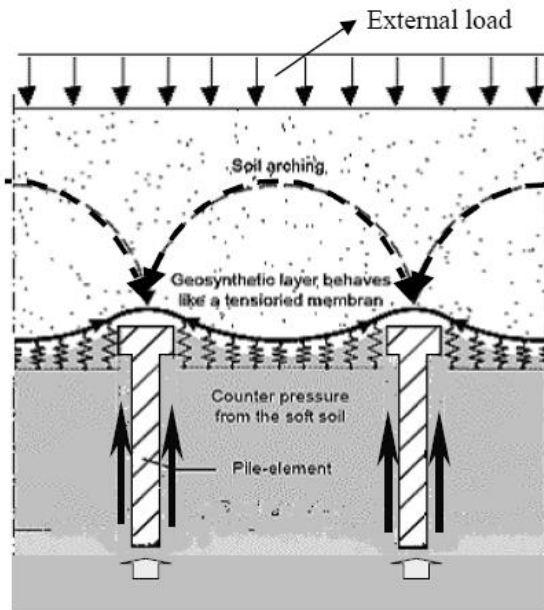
Load transfer mechanism in basal reinforced piled embankment
